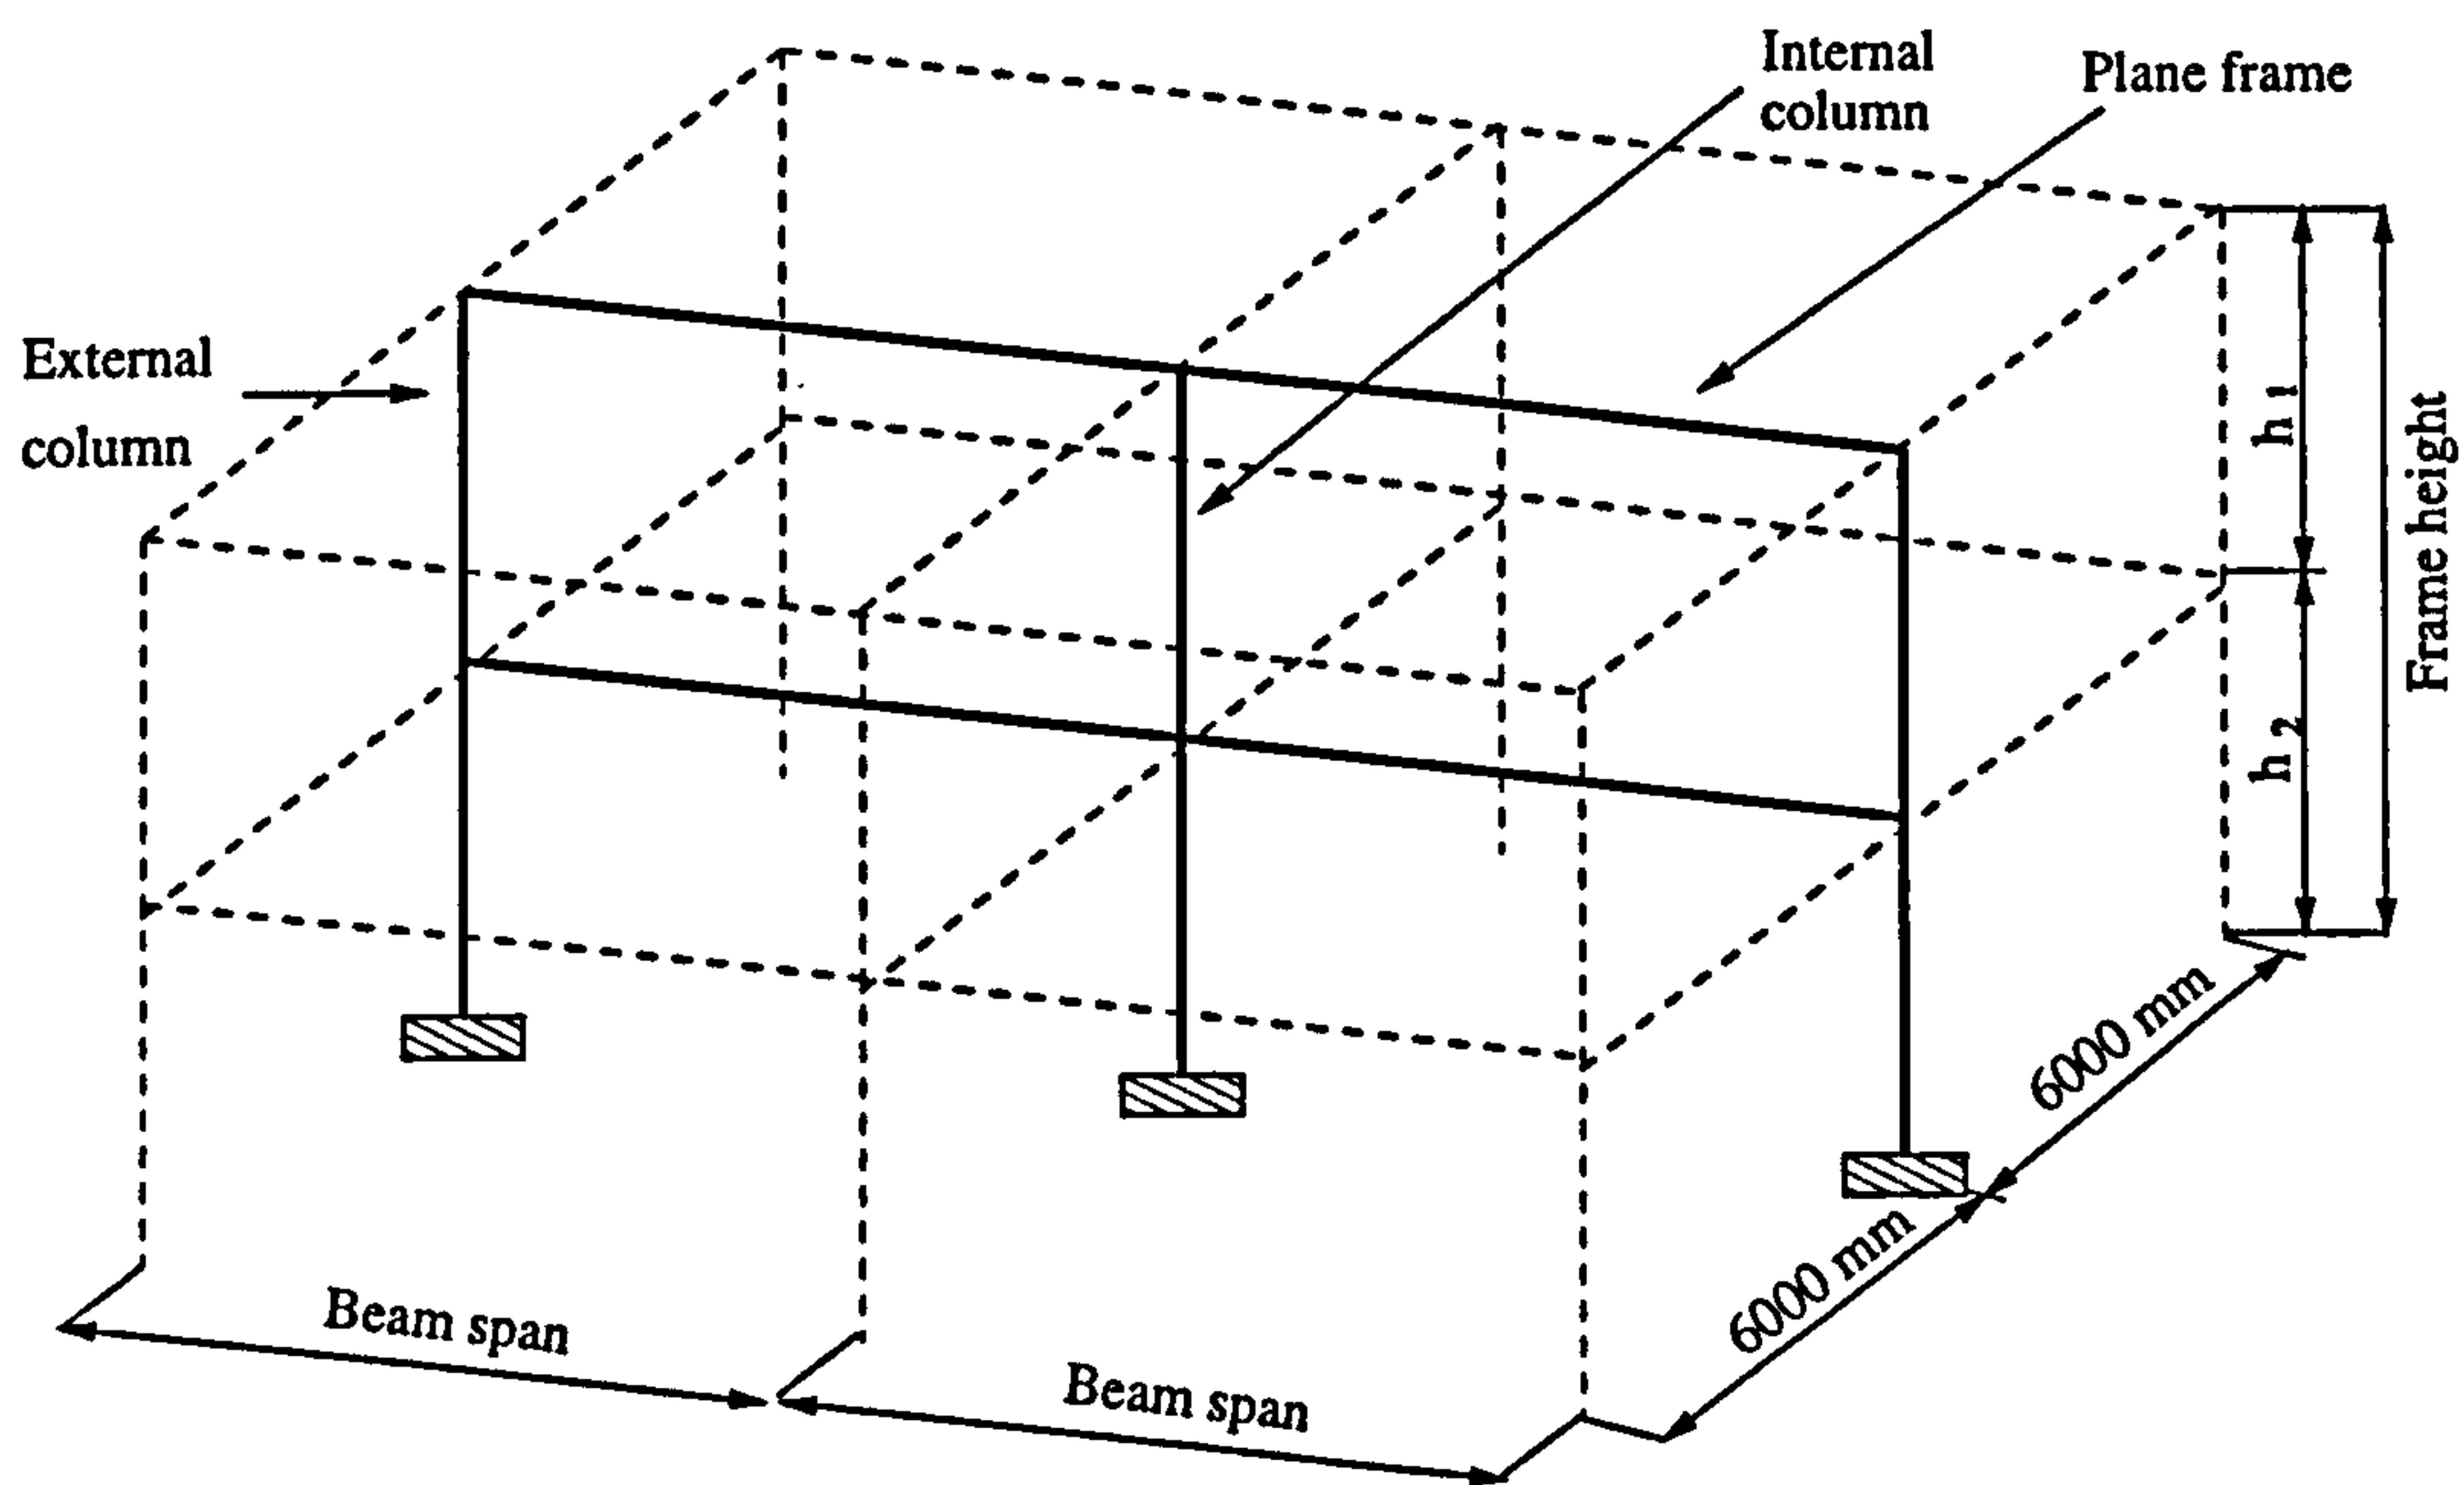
(a) Typical layout for two bay frames (three dimensions)
